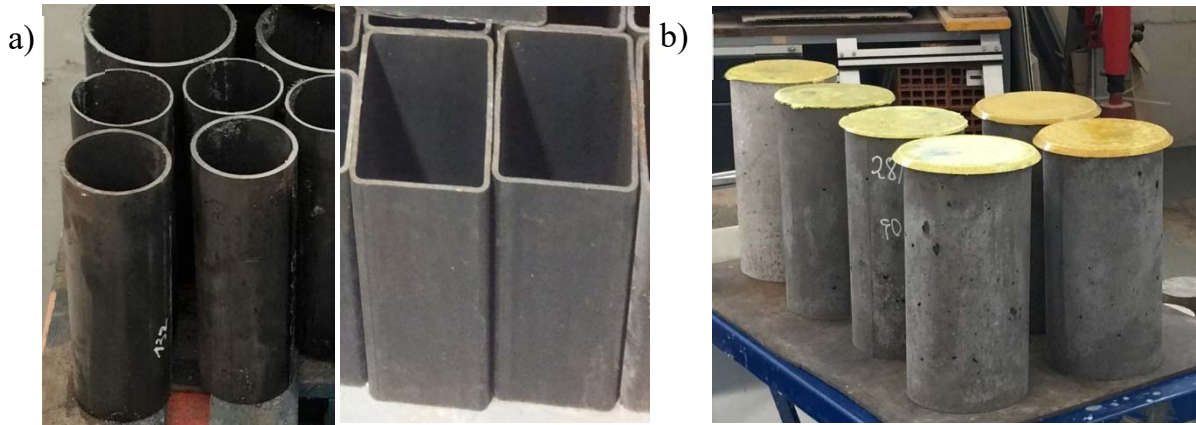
a) Hollow steel tubes; b) Concrete cylinder samples.
